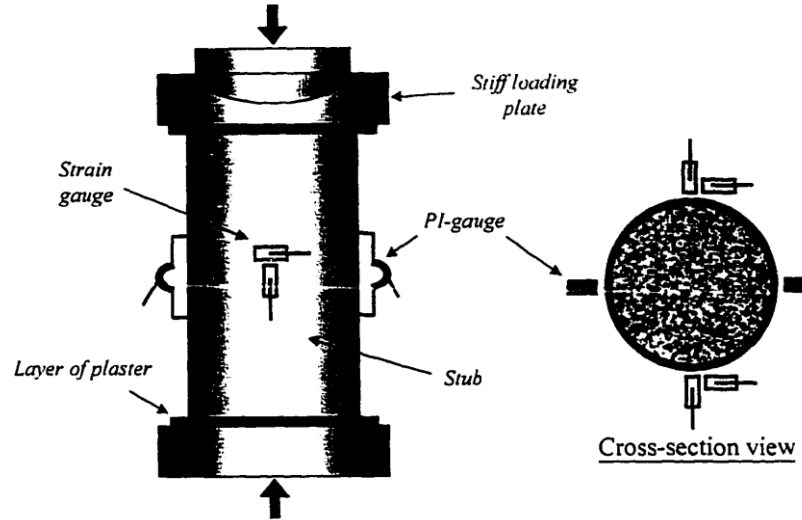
Stub test setup and cross-section view (Fam, 2000)
